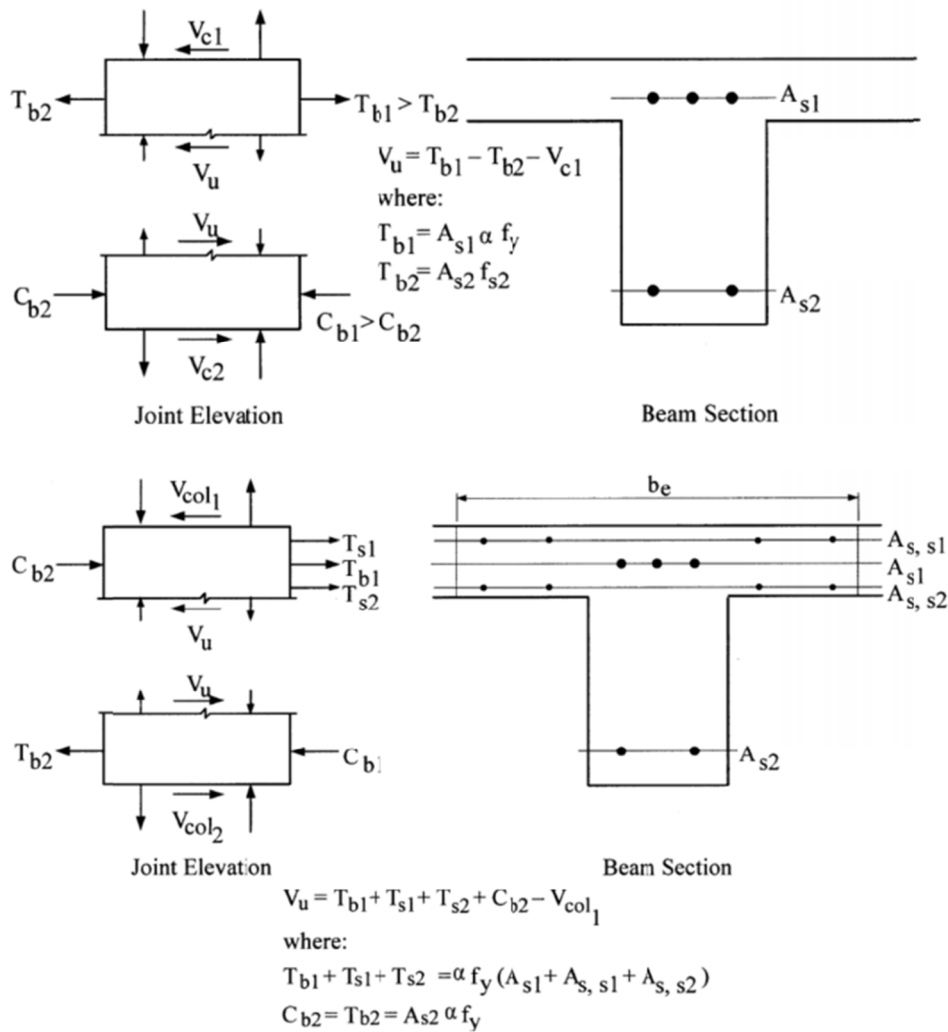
Horizontal joint shear calculation by ACI 352-02.
